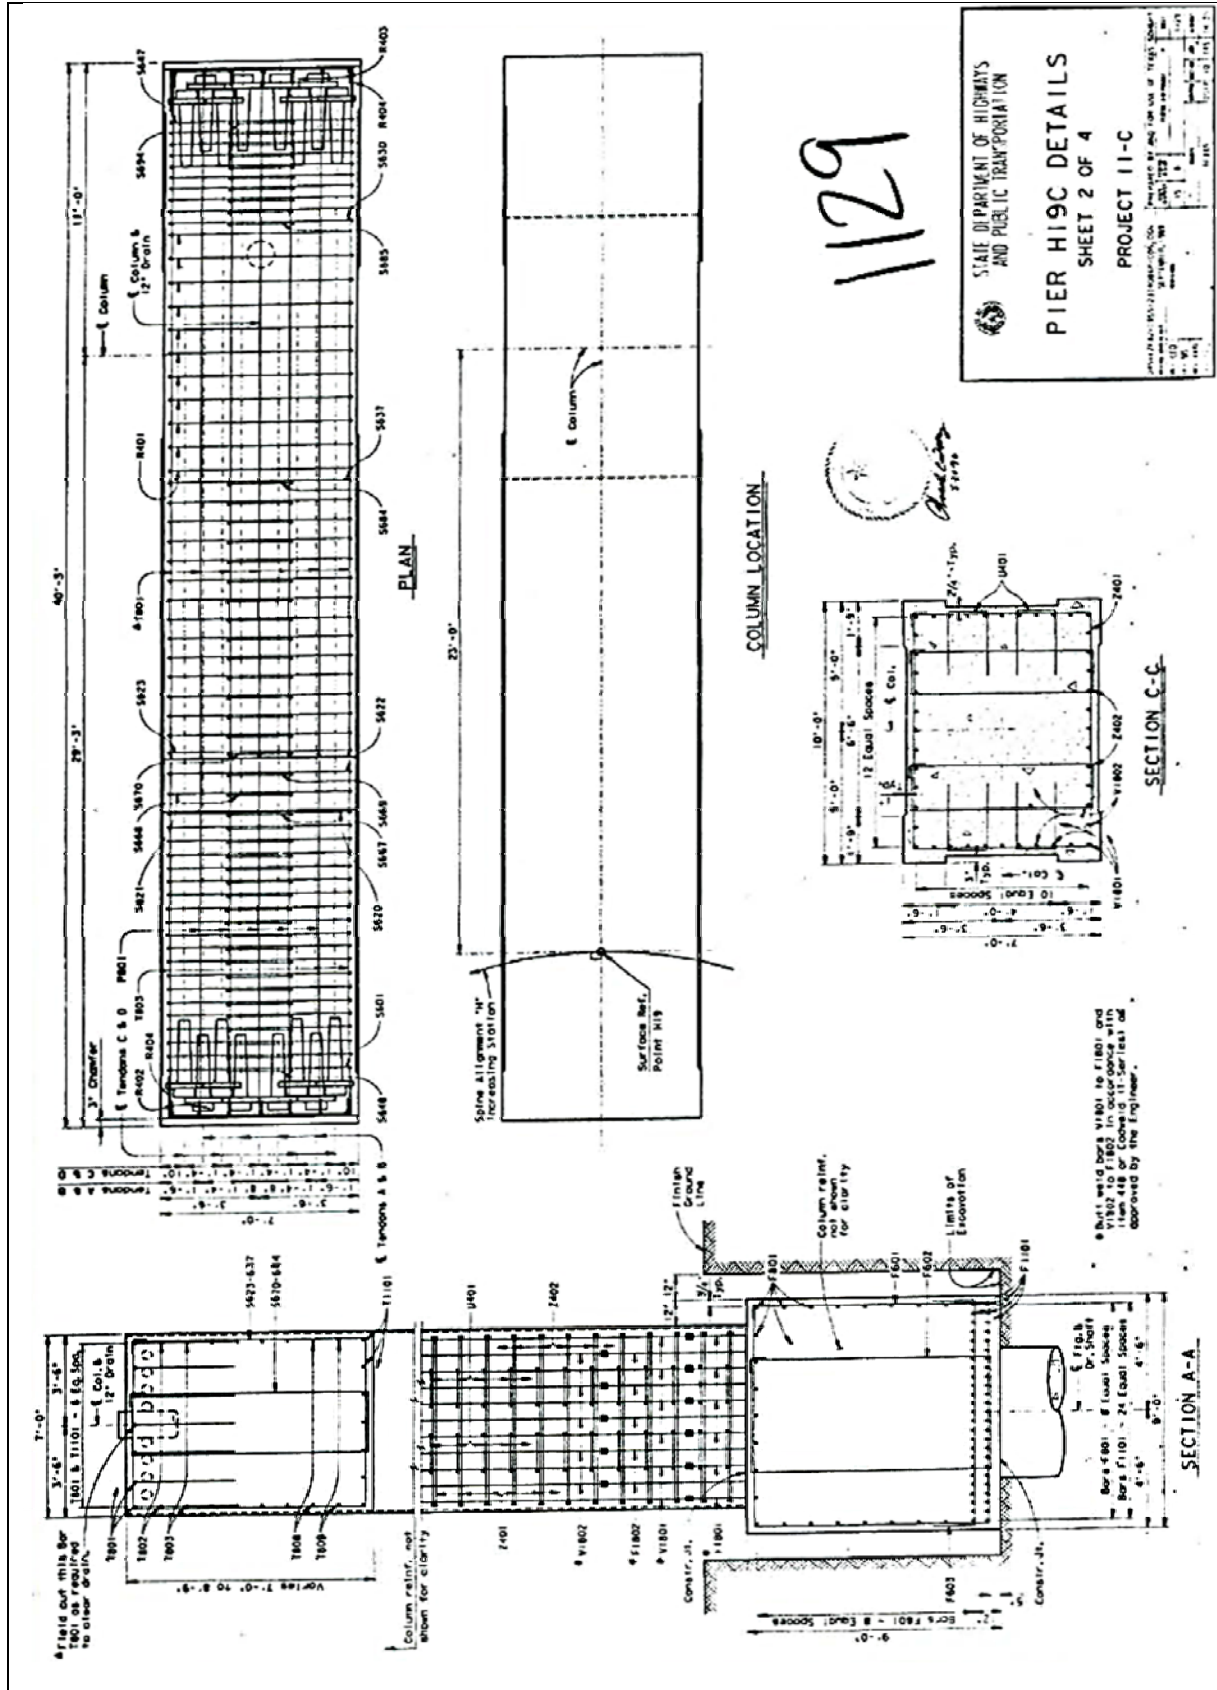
Layout and Reinforcement Detail of Pier H19C-Sheet 2.
